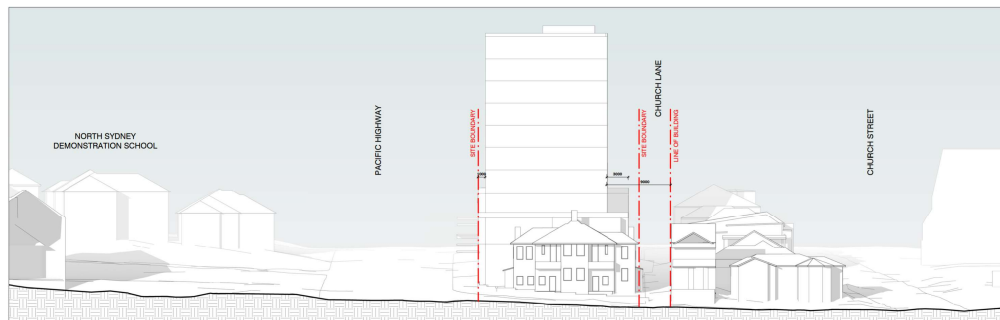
Southern elevation, including the residential buildings along McLaren Street and Church Street. The outline of St Thomas's Church is shown to the right of the diagram. These items continue to be appreciated and contribute to the McLaren Street Conservation Area. The contributory buildings 6-8 McLaren Street are located on the southern end of the development, the podium envelope has been refined to ensure a sympathetically scaled setting can be created in a future proposal. (Source: PTW Architects)
